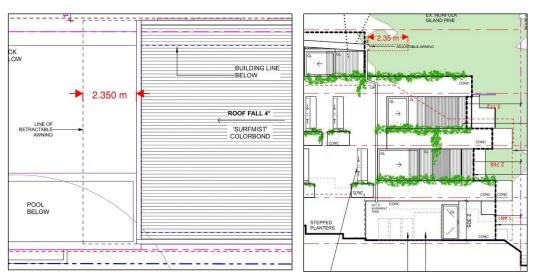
& 41: Rooftop plan and east elevation (Source: Burrow Architecture) Retractable awning marked up on elevation by Council Assessment Officer
